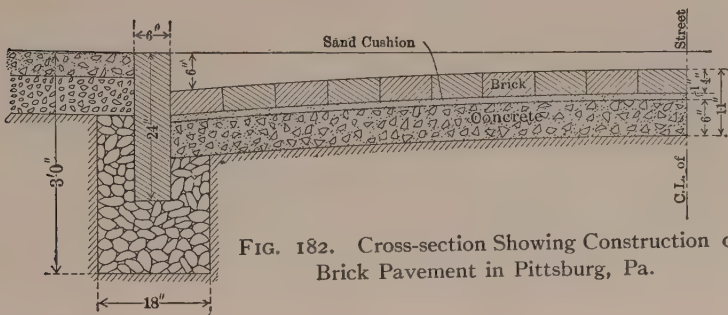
Cross-section Showing Construction of Brick Pavement in Pittsburg, Pa.
